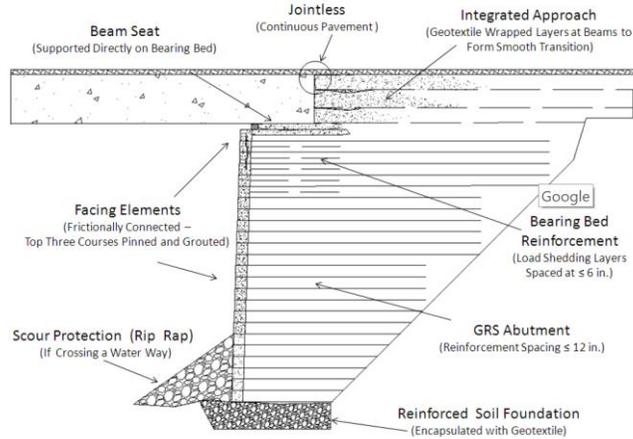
Typical Section of a GRS/IBS Bridge abutment [1]
